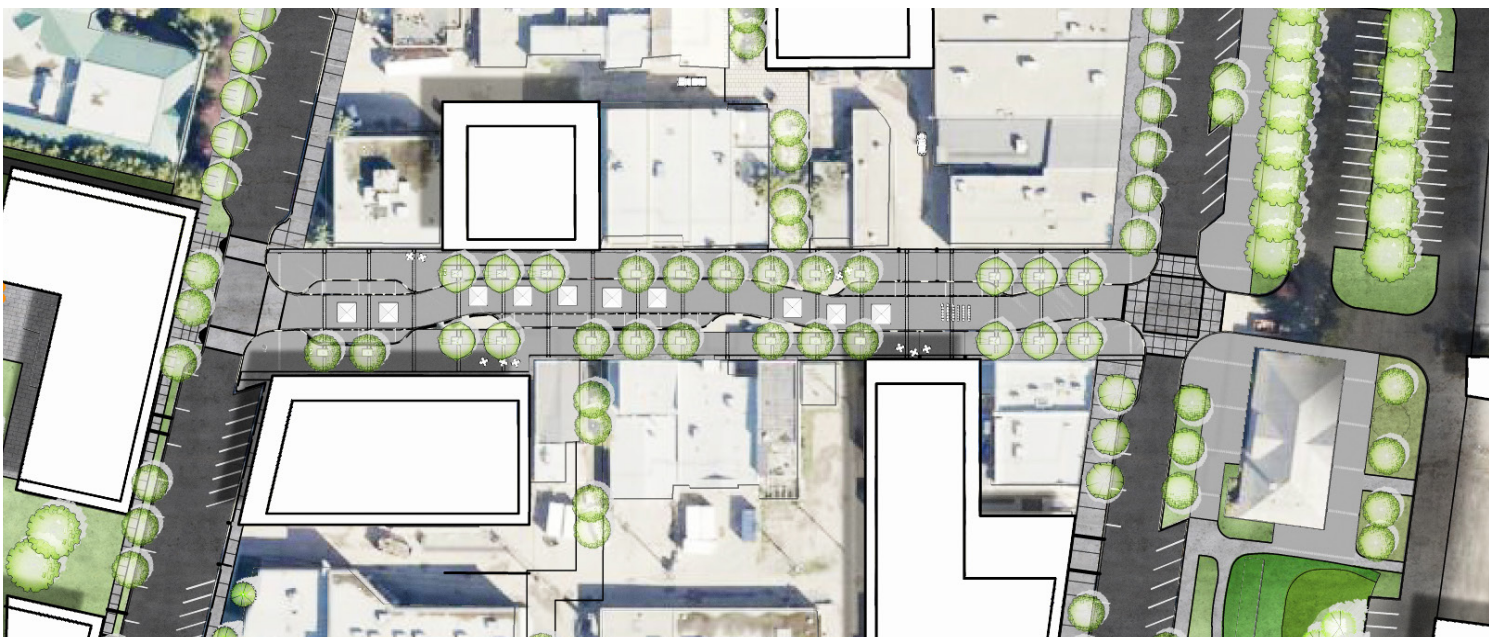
Historic Downtown Woonerf Concept Plan View
